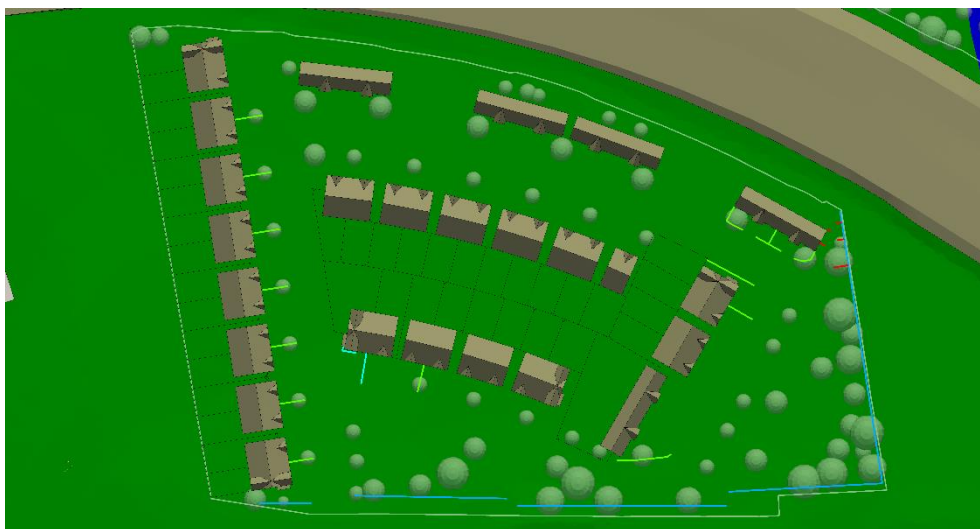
Proposed Model Geometry - Plan View of 'Parkside' Character Area.
